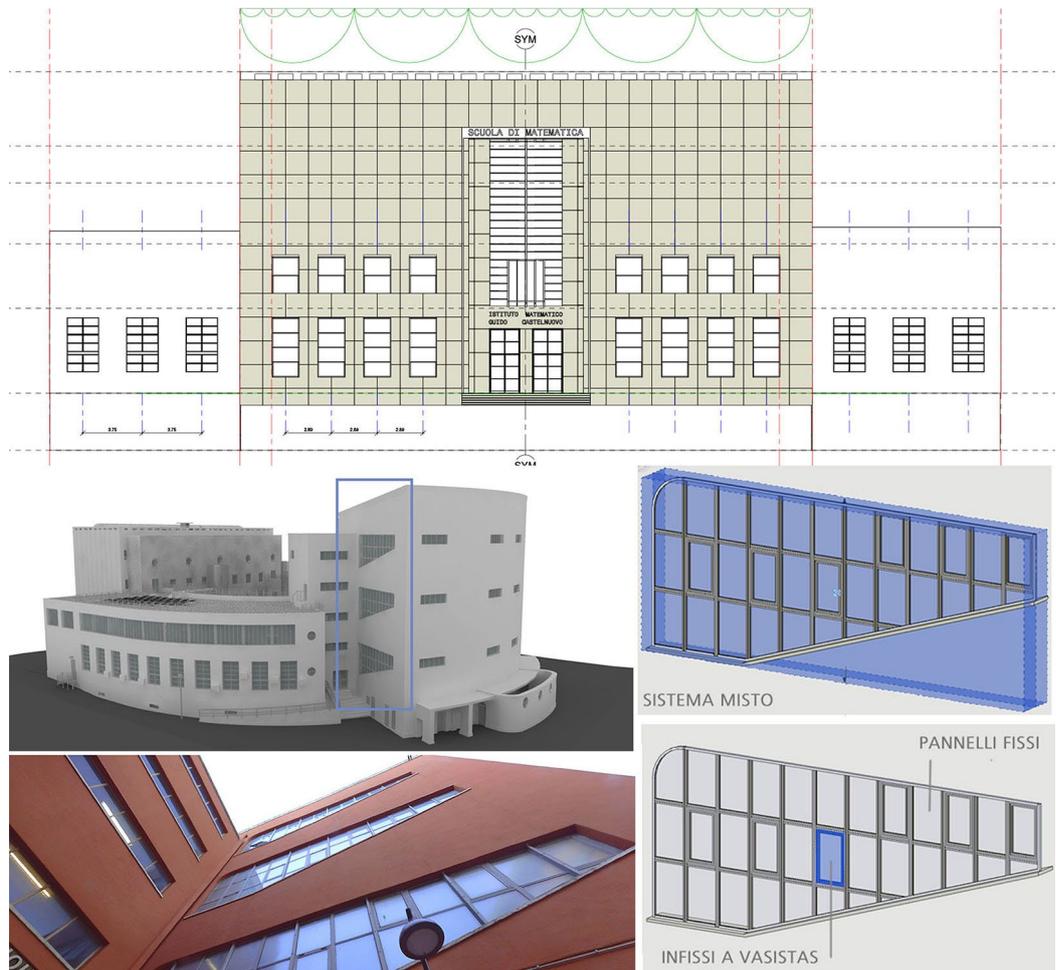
Building Information Modelling. Construction of opaque curtain walls for the main facade of the Mathematics School and construction of mixed curtain walls. Graphic elaboration by author; Autodesk Revit 2022 software.
